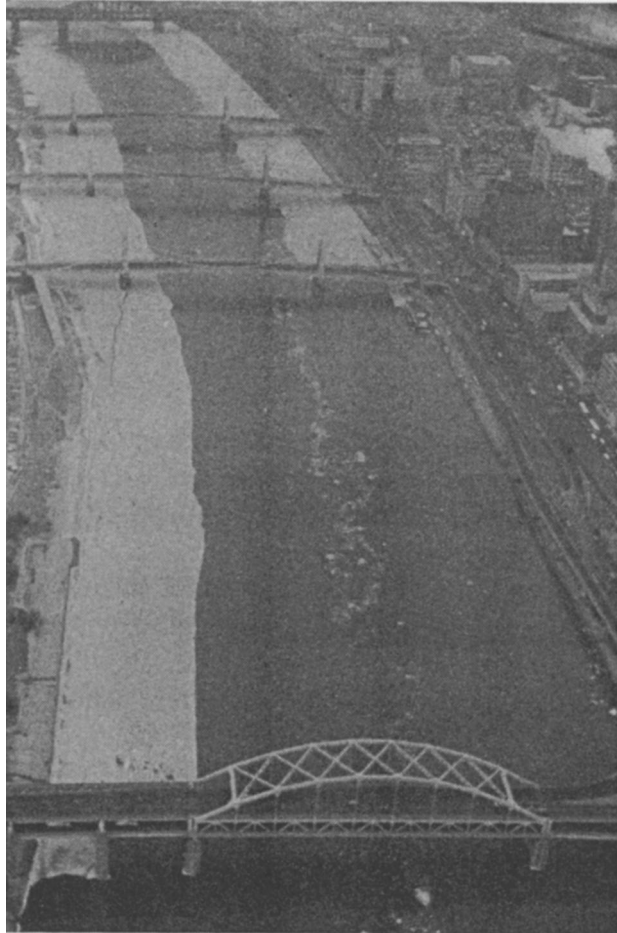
Shore ice formation, with bridge piers providing added stability to the shore ice.
